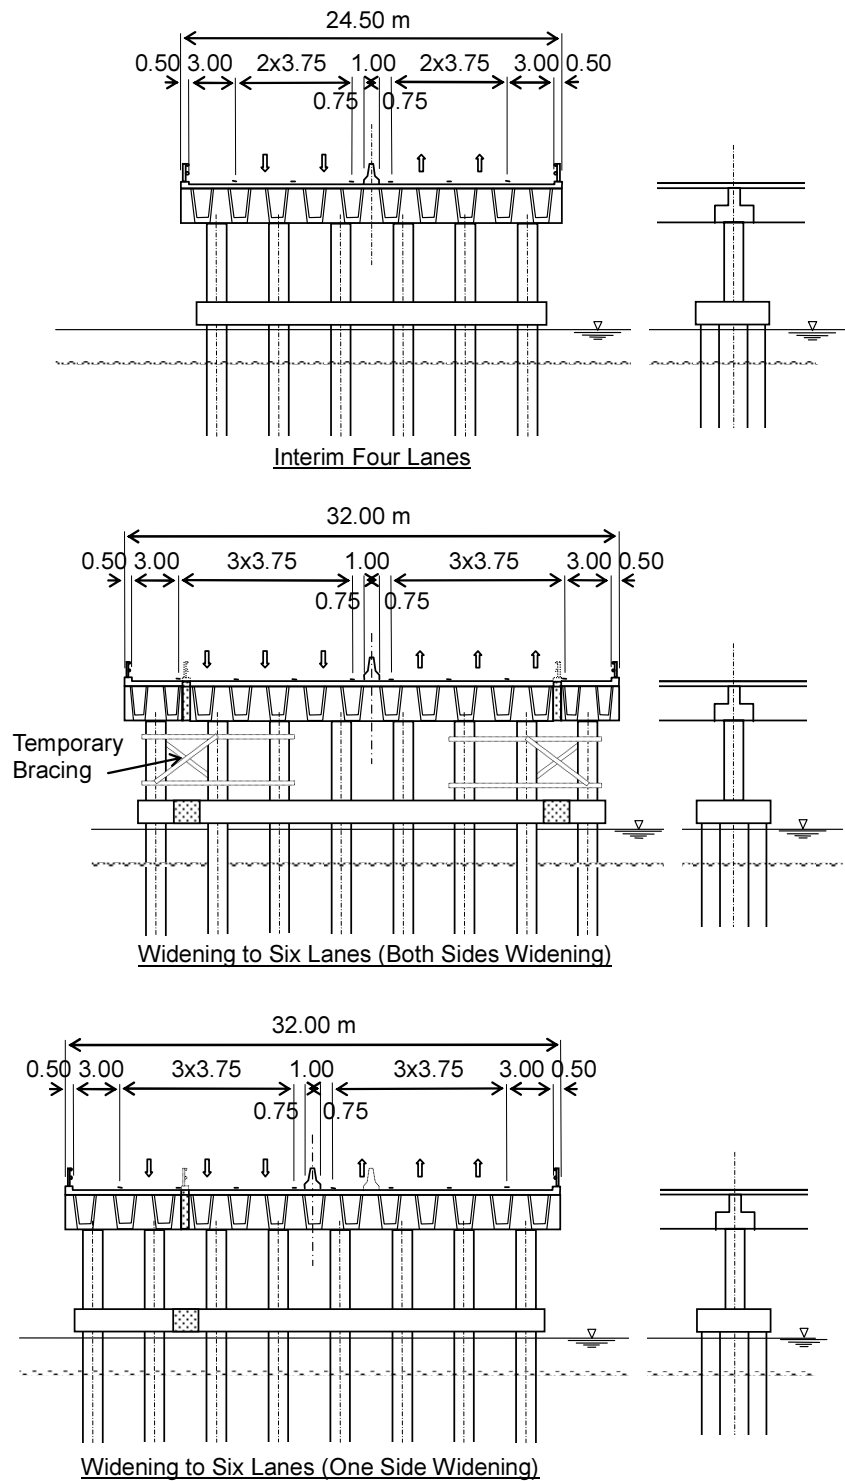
Stability of Bridge Secured by Bridge Structural Frame
